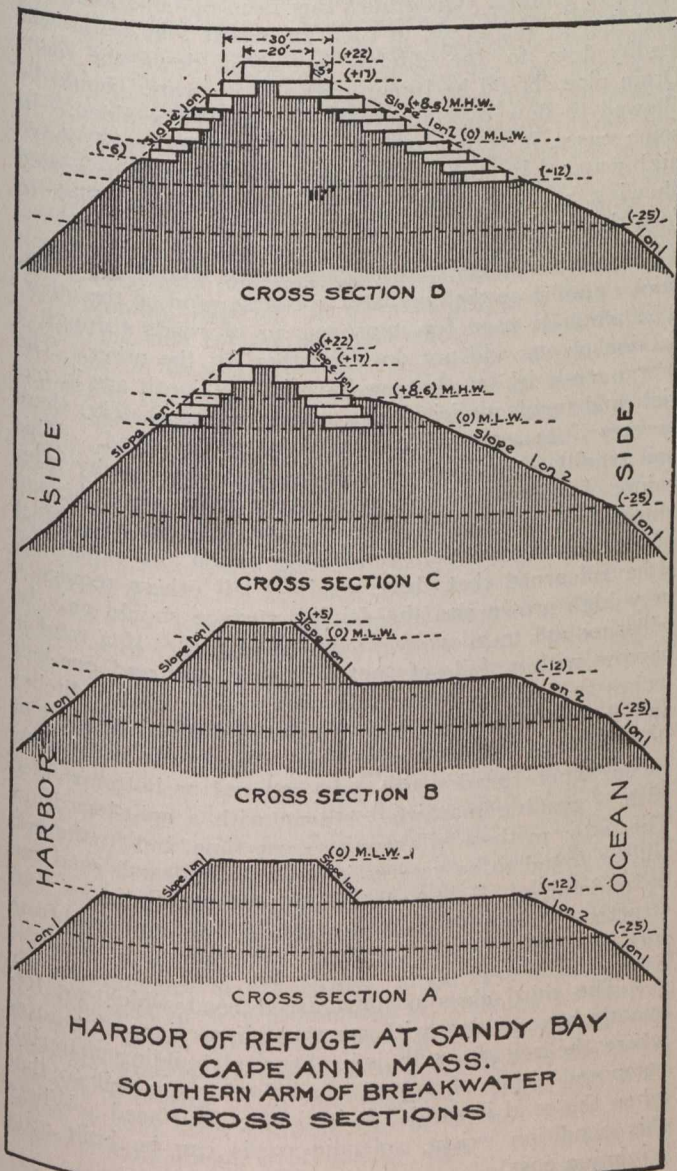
Sandy Bay Breakwater Cross Sections.
